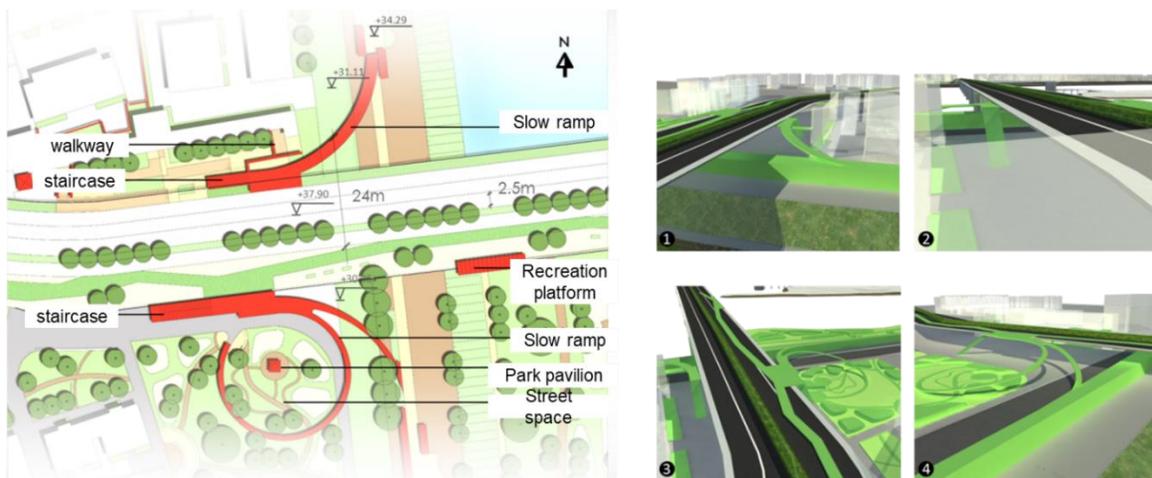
Reconstruction of the west end of Lanjiang Bridge
